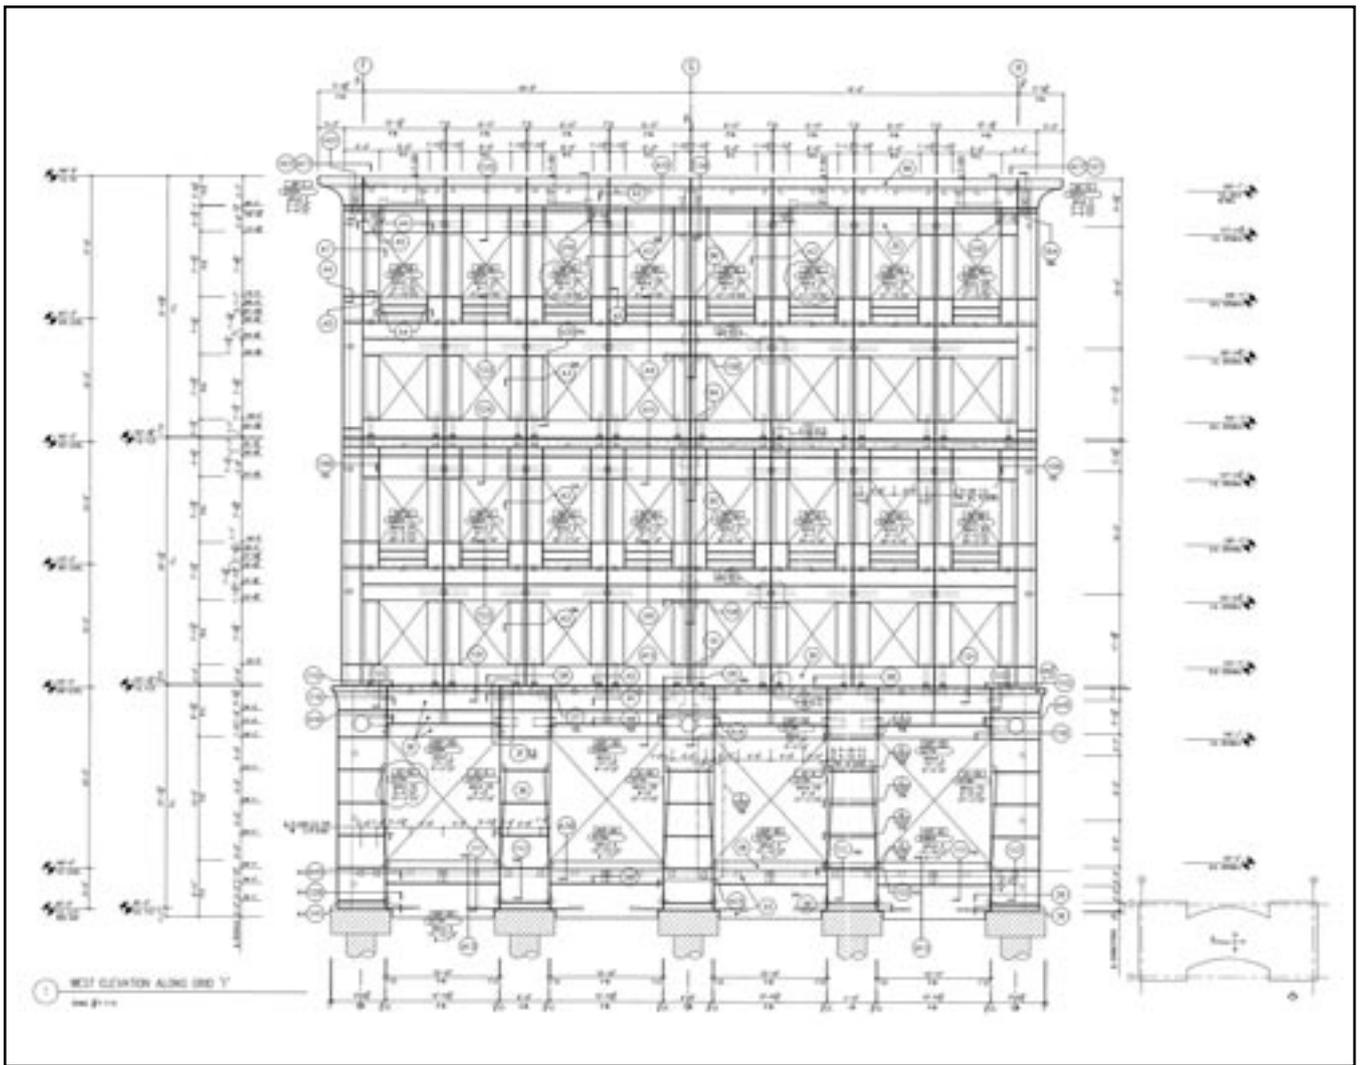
West elevation of the Aurora Municipal Center at Grid Y.
